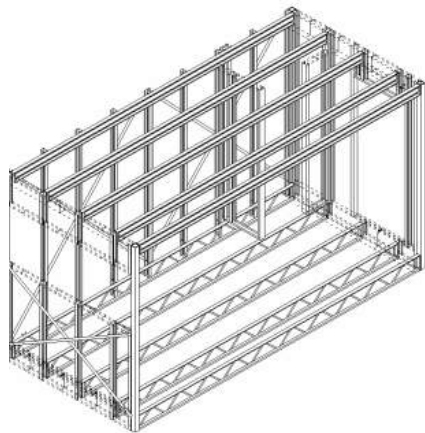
Smaller open-sided module using longitudinally spanning lattice joists
